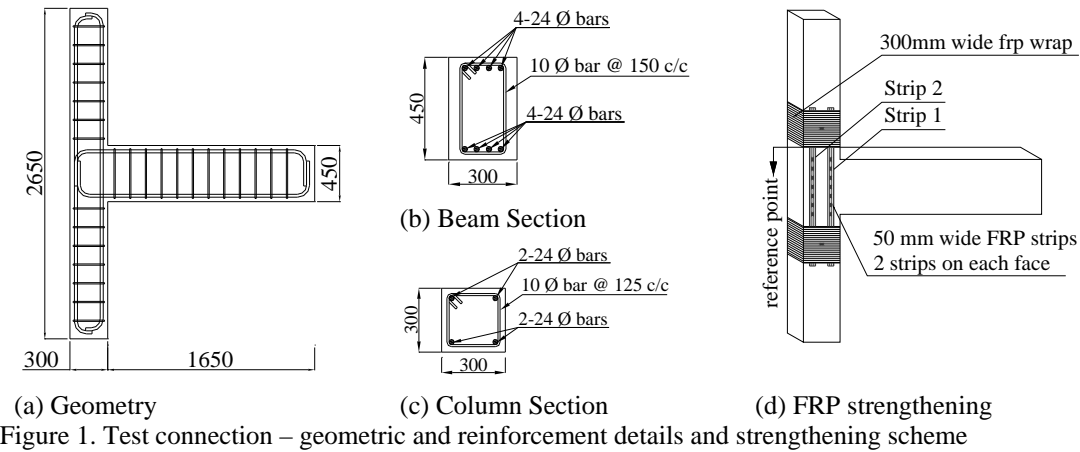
Test connection – geometric and reinforcement details and strengthening scheme
